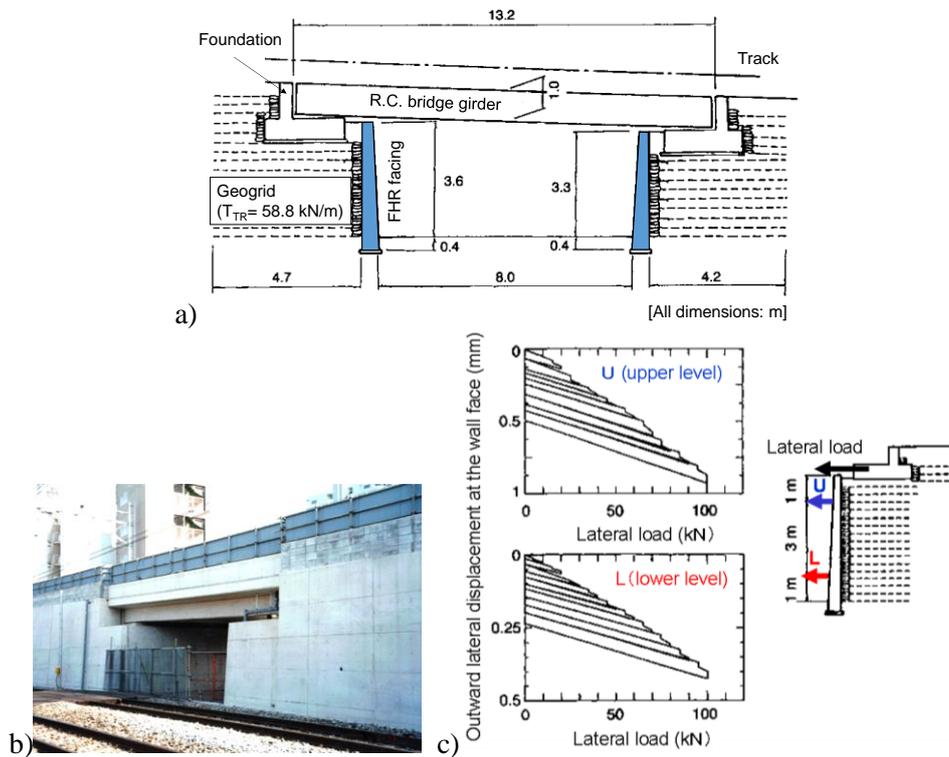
GRS Bridge Abutments (first generation) near Sakuradai station, Seibu Ikebukuro line, Tokyo; a) elevation of the bridge; b) completed bridge; and c) lateral loading test of a GRS Bridge Abutment (other than those shown in Figs. a & b), performed 24 June 1993.
